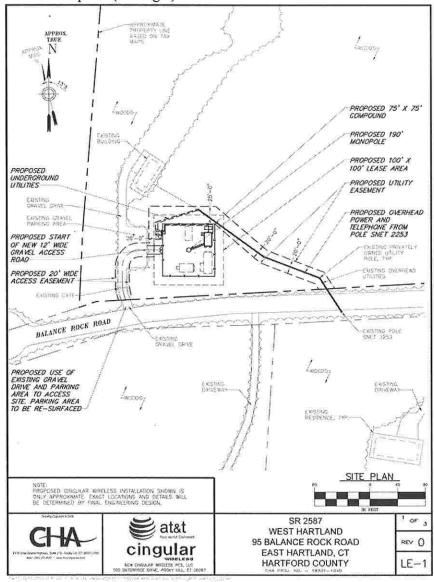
Site plan indicating location and size of proposed area for development. Map provided by Meaghan Fahey, The Ottery Group.
